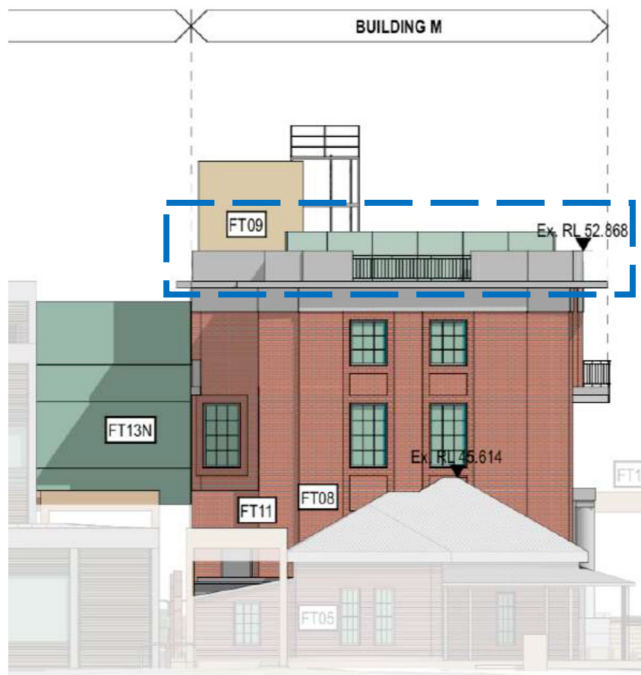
The SSD HIS, with the Safety Protection Structures indicated in dash blue outline (Figure 8.26: Transparent Bridge connection between MET and Building J, distinct and recessive to heritage item (Source: FJMT Studio 2020: 65)).
